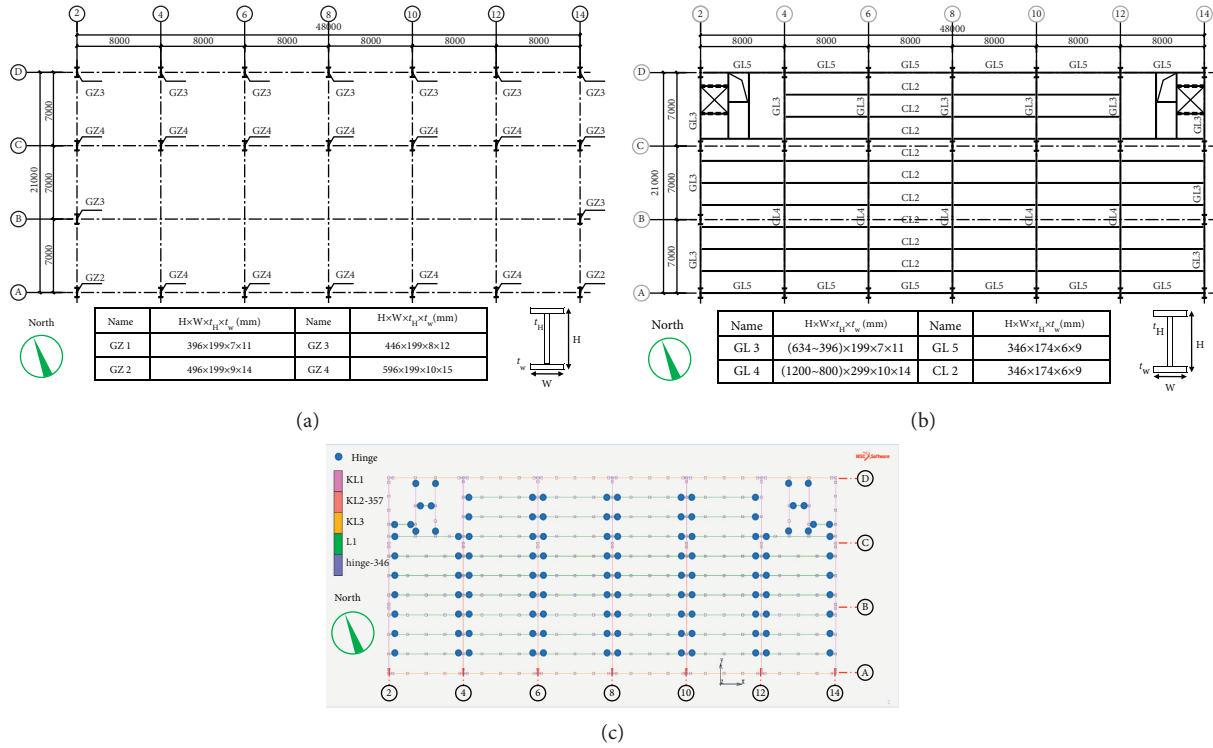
Drawings of the typical floor. (a) Column layout (units: mm). (b) Beam layout (units: mm). (c) Connections between beam and columns.
